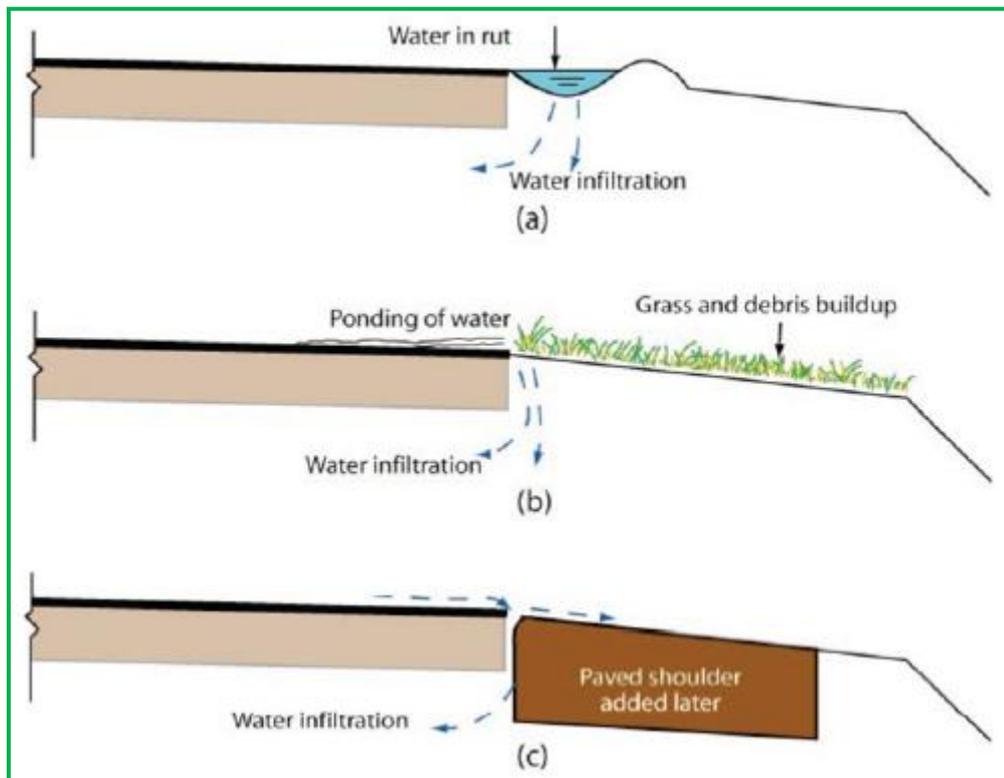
Typical drainage deficiencies associated with pavement shoulder construction (adapted from Birgisson and Ruth, 2003)
